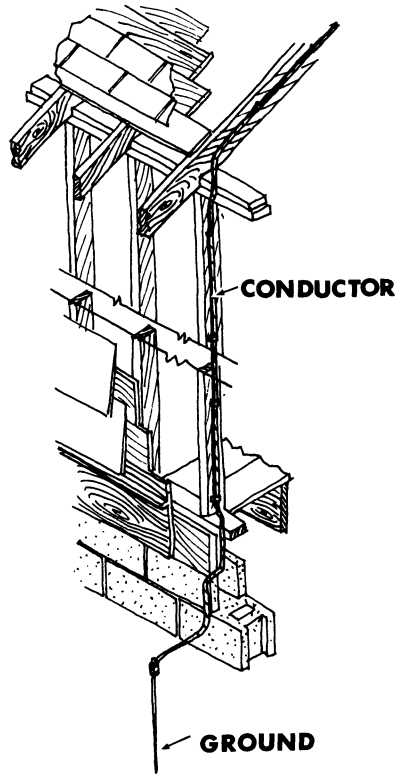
In concealed lightning protection system, the ground connections are made through the base of the building wall.
